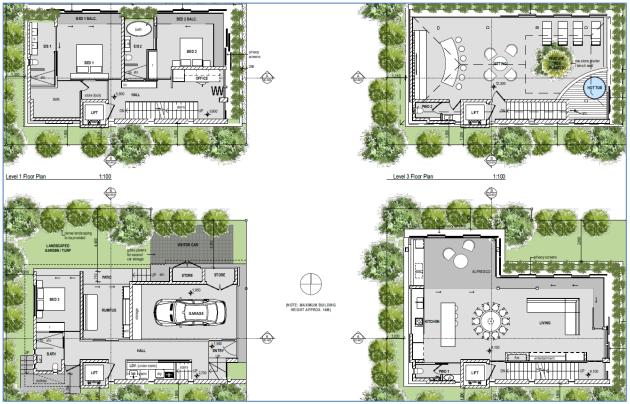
Floor Plan. Ground floor bottom left and 4th floor bottom right
